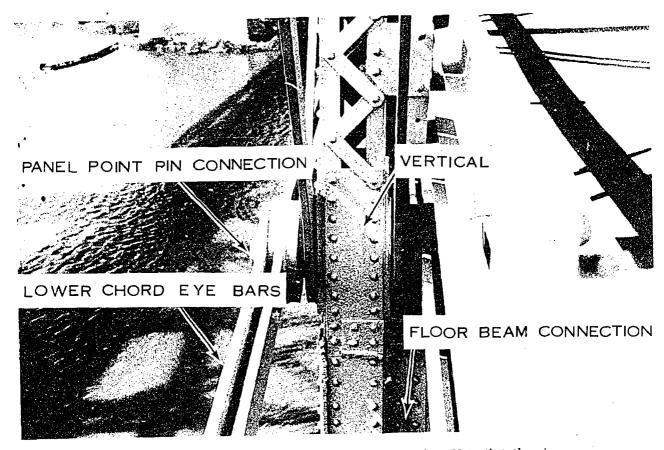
Detail of lower chord panel point connection. Note that the pin connection and floor beam connection beneath are exposed to moisture and brine splashed from the roadway.
